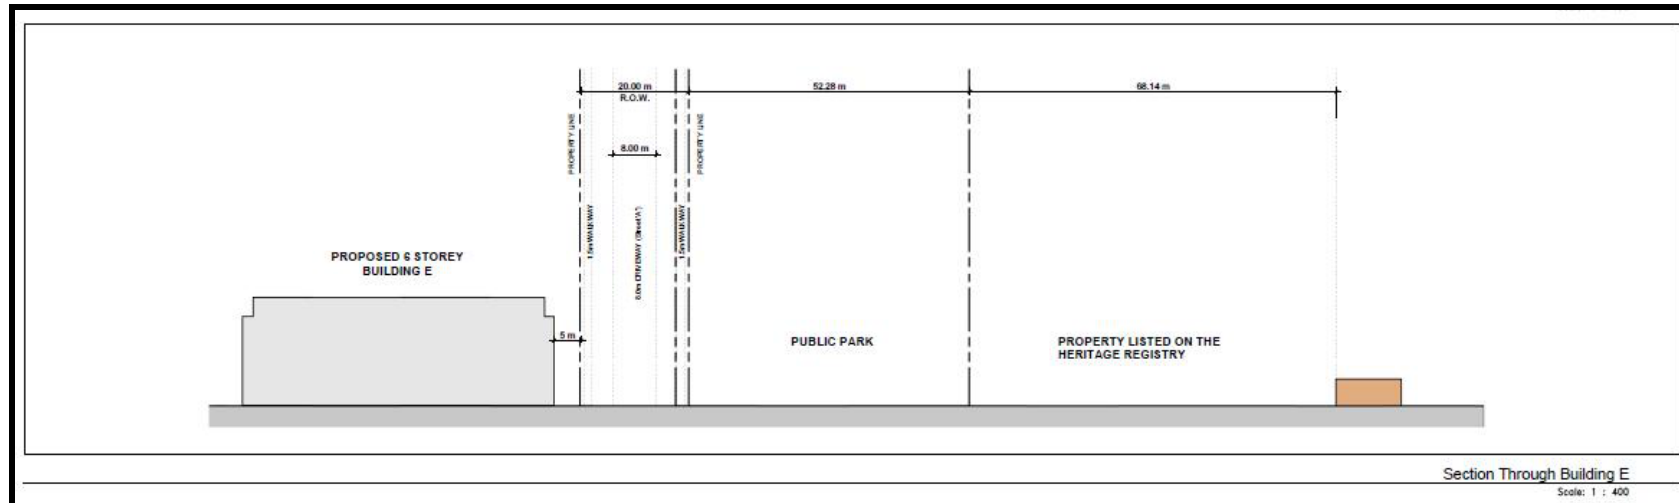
July 2021 Proposal Section Showing Proximity of Building E to 5104 Ninth Line, looking Southwest (Kirkor 2021b)
